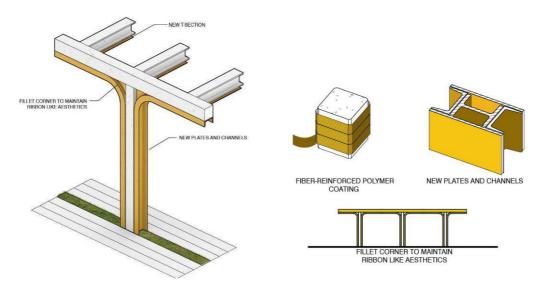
Structural Reinforcement (source : www.aoarchitect.us)
